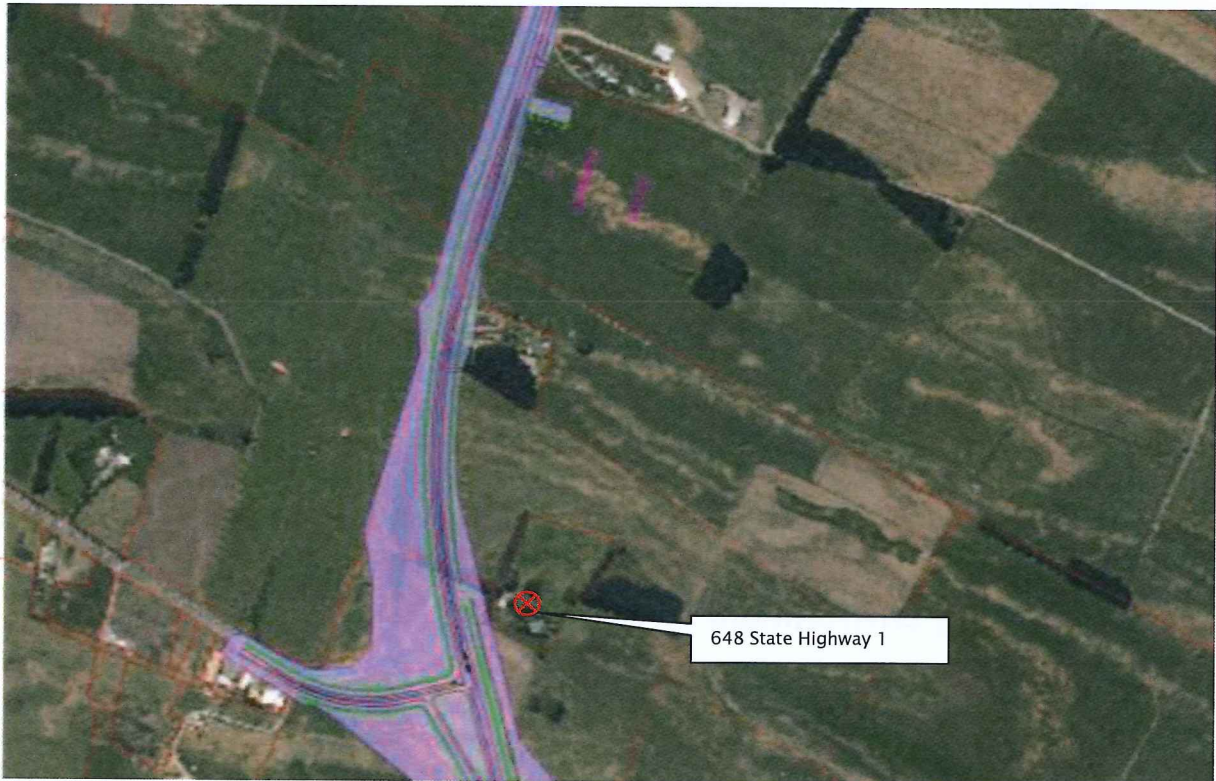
Measurement location north of Waitarere Beach Rd Intersection.
